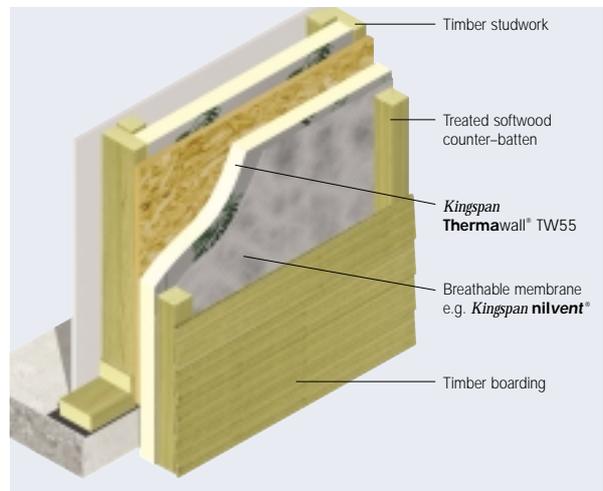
Timber Clad / Tile Hung Timber Frame Wall – Insulation Between Studs and Insulating Sheathing
